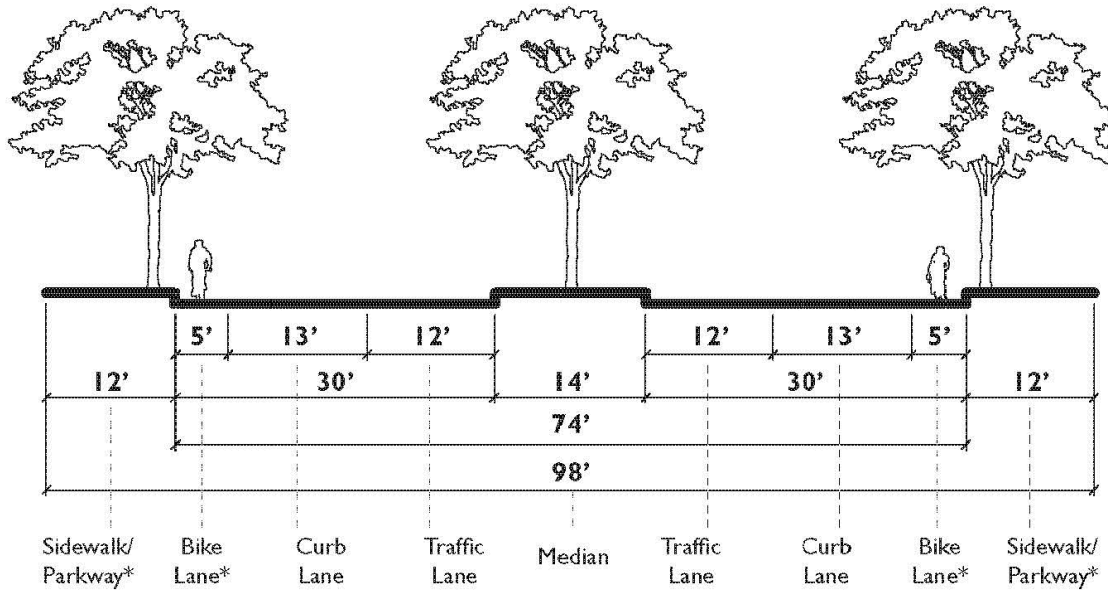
CITY OF CHINO GENERAL PLAN ROADWAY CROSS-SECTIONS (SHEET 2 OF 3)
